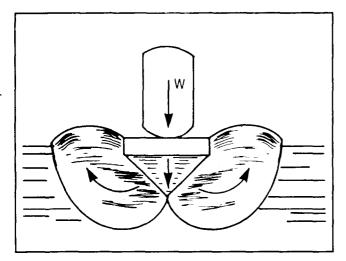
Bearing capacity or sinkage failure of footing on cohesive sediment, vertical noneccentric loading. W = submerged weight of structure.
